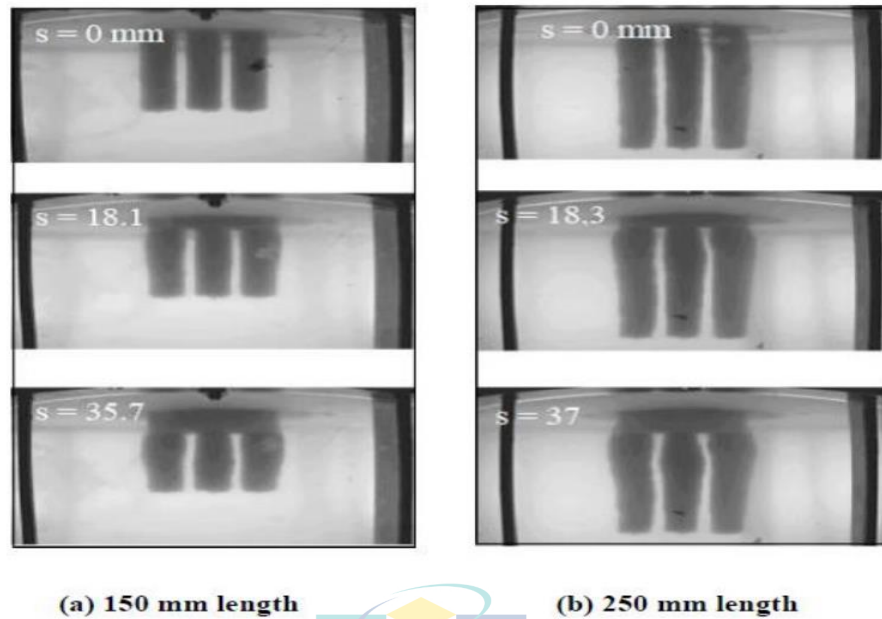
Photographs of group of sand columns beneath the strip footings
